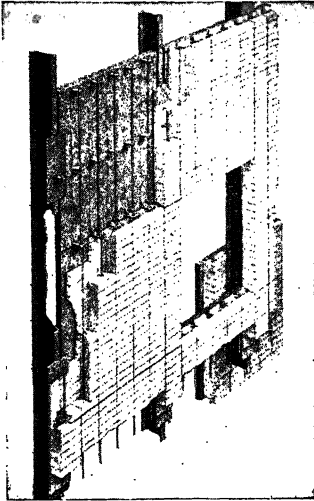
Integral-panel wall construction in which insulating firebrick are strung on rods extending the height of, and attached to, the separate panels of each casing.
